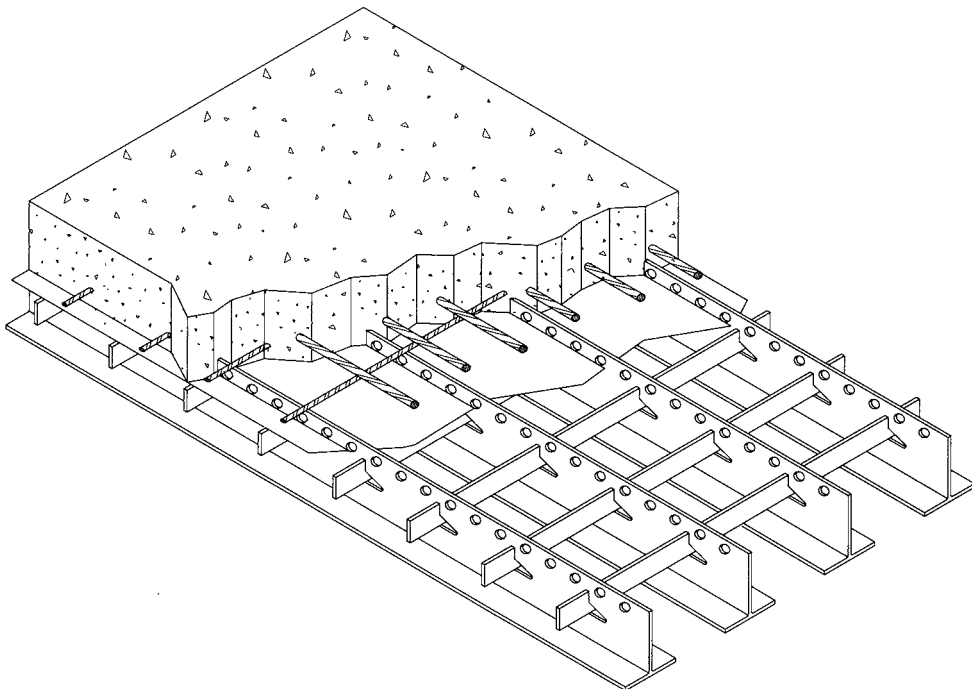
Exodermic deck system. (Source: Exodermic Bridge Deck Inc., Lakeville, CT, 1999. With permission.)
